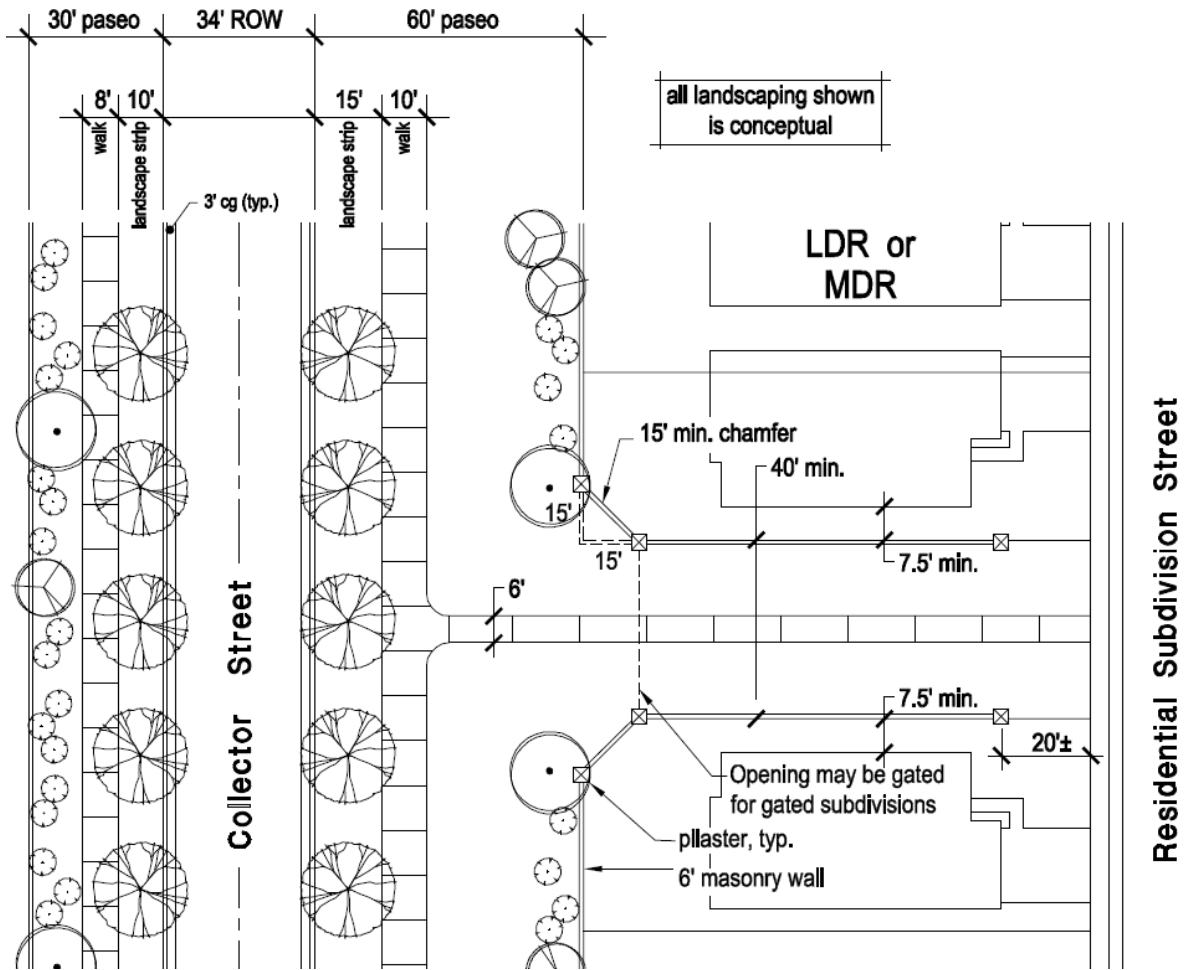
Collector Street Paseo Connection at Pedestrian Way
